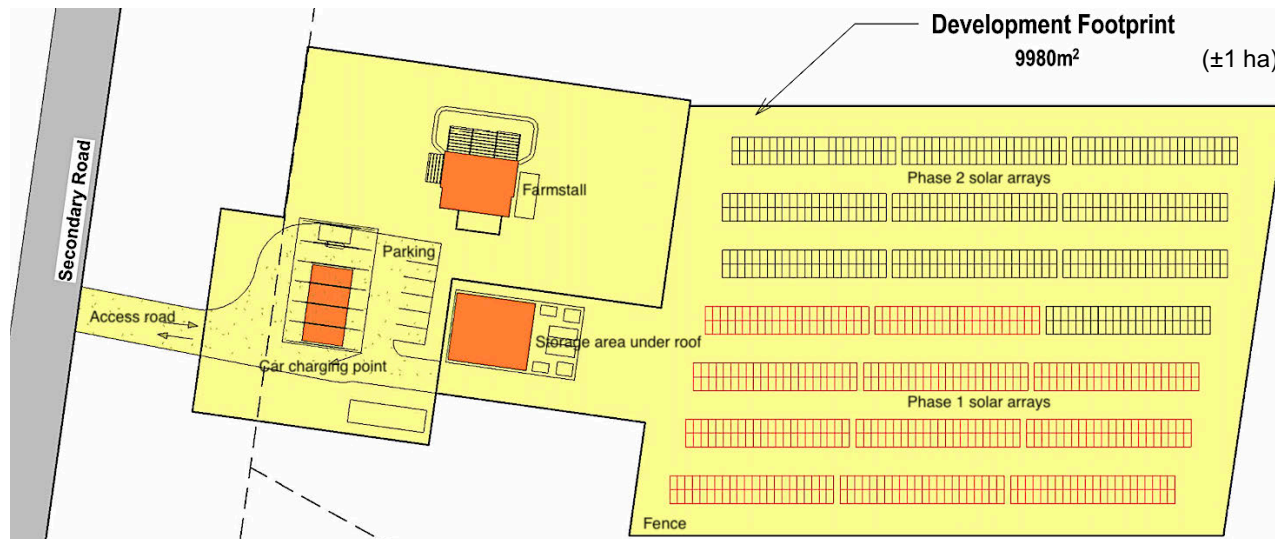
Typical site development plan for a 1 hectare car charging station and solar facility.
